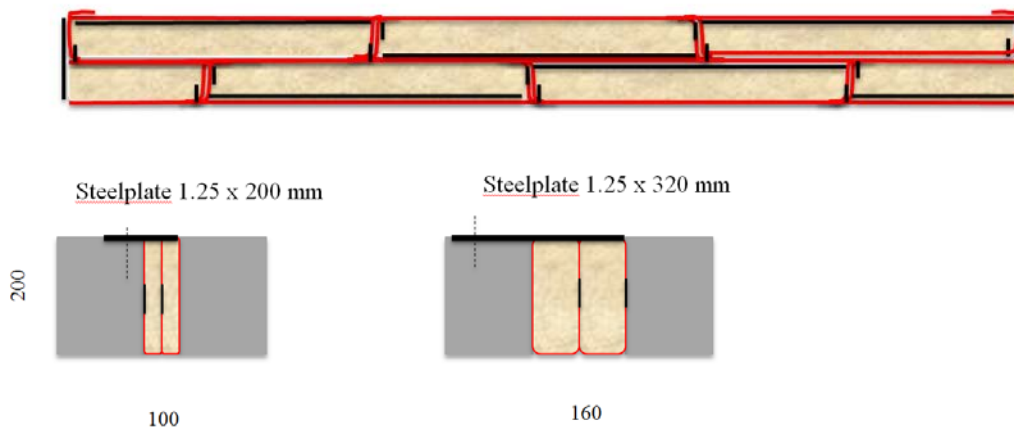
Top view and cross sections of semi-brick bond lay-out applied Firetight® (with steel plates).
